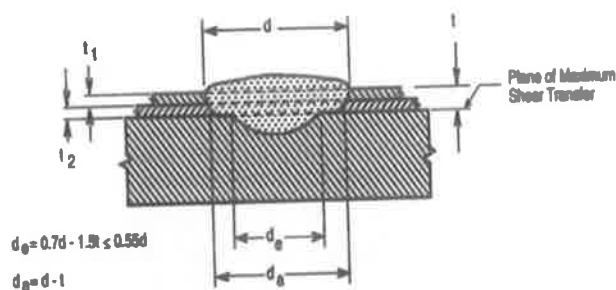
Arc Spot Weld – Single Thickness of Sheet
